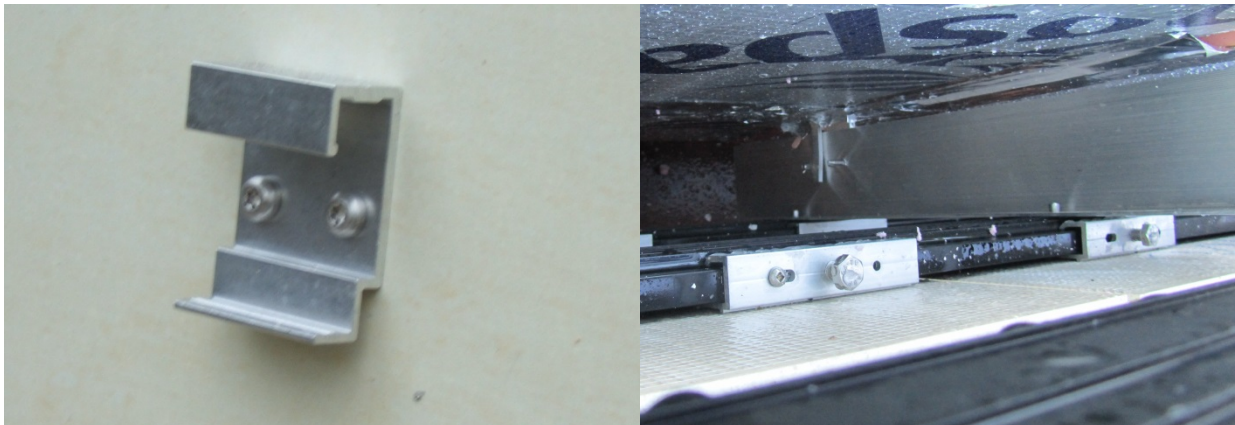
Panel fixing with bracket fixed to back of panel
